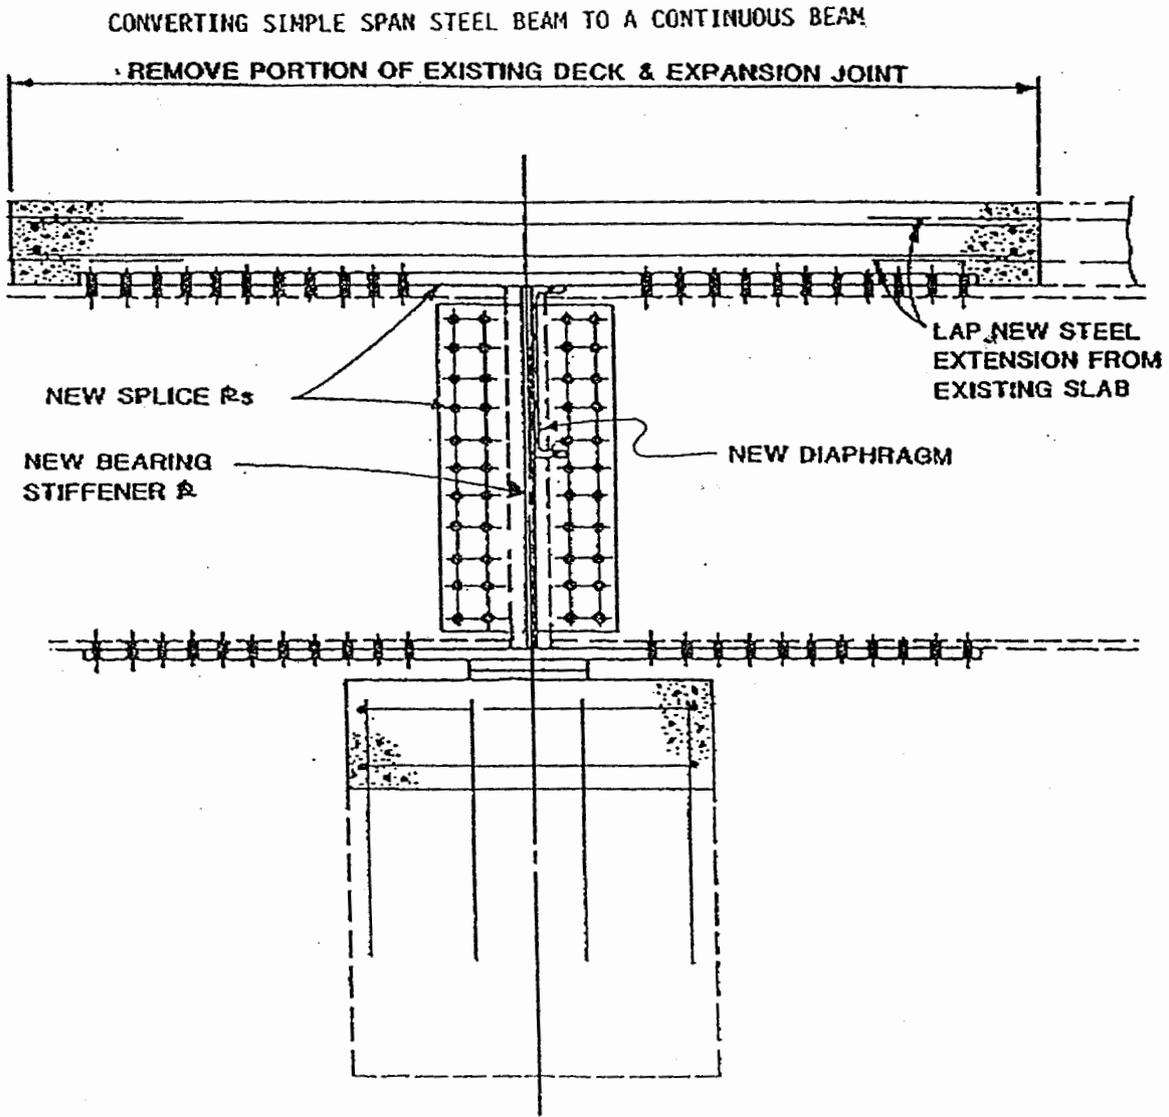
Deck and Bottom Flange Connection: Connecticut
